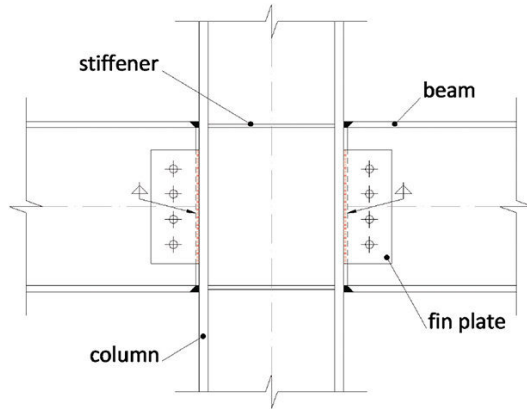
Type of a rigid beam to column connection applied in existing buildings
